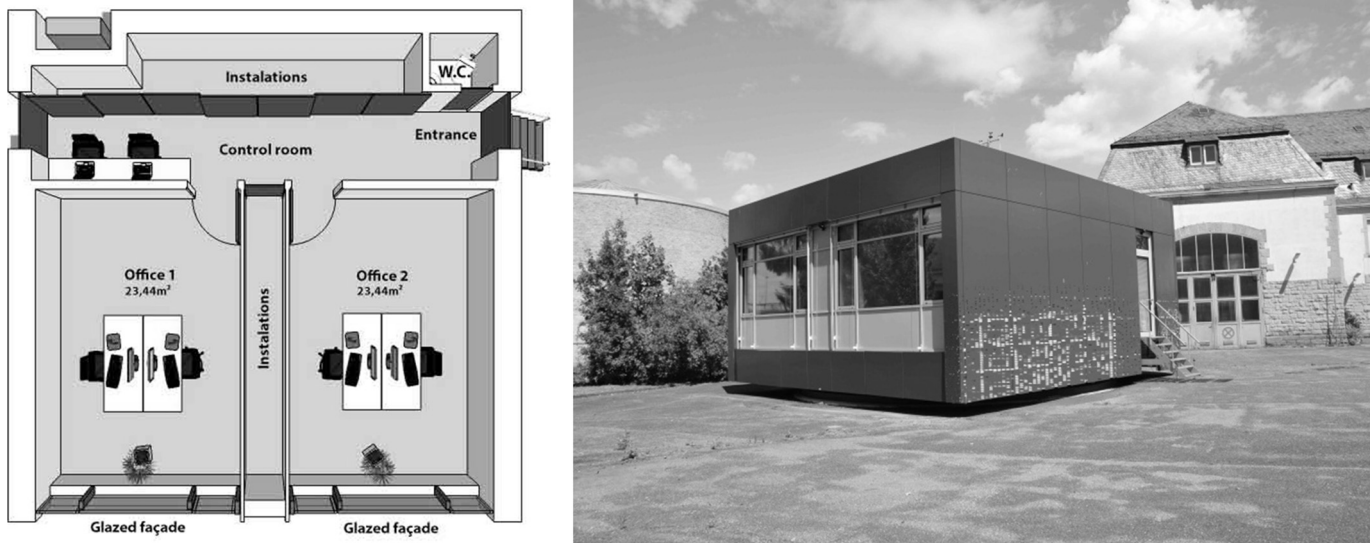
Floor plan and the LOBSTER test facility in summer (July 2015).
